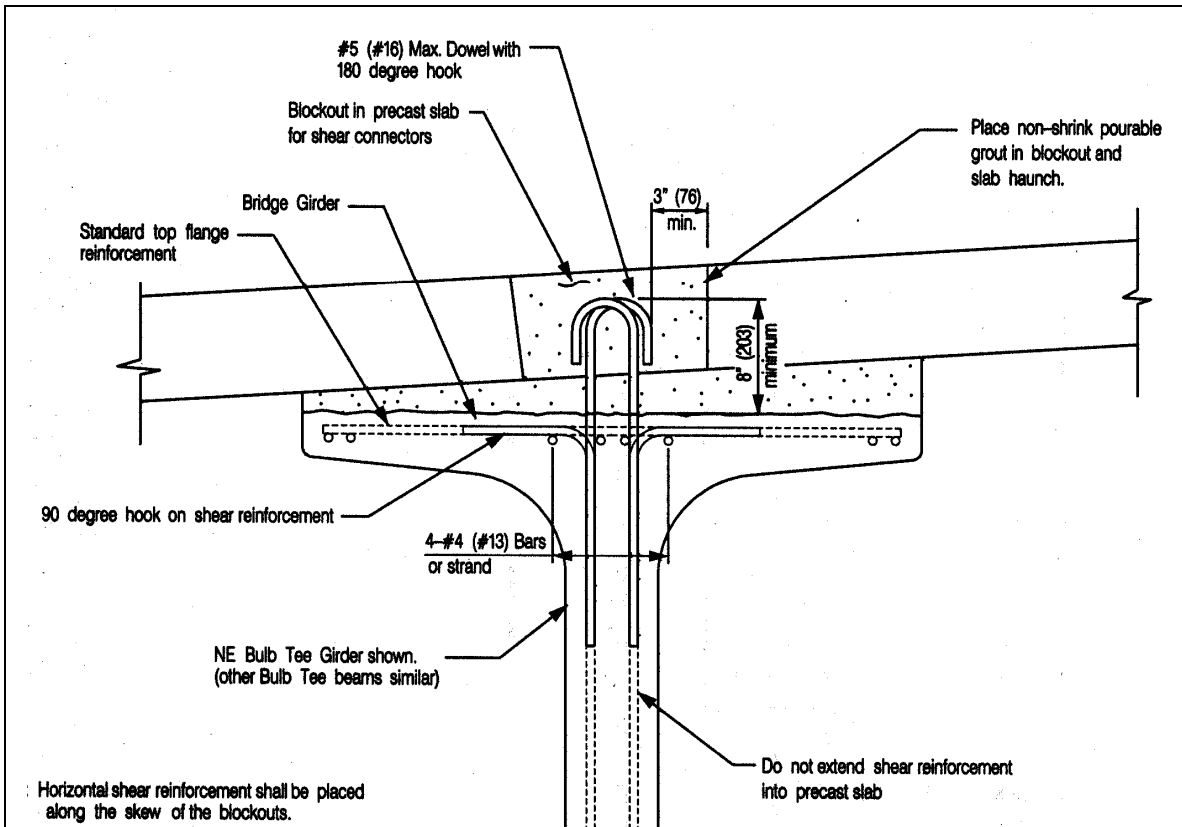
Typical precast concrete girder/deck connection for new construction (PCINER, 2002)
